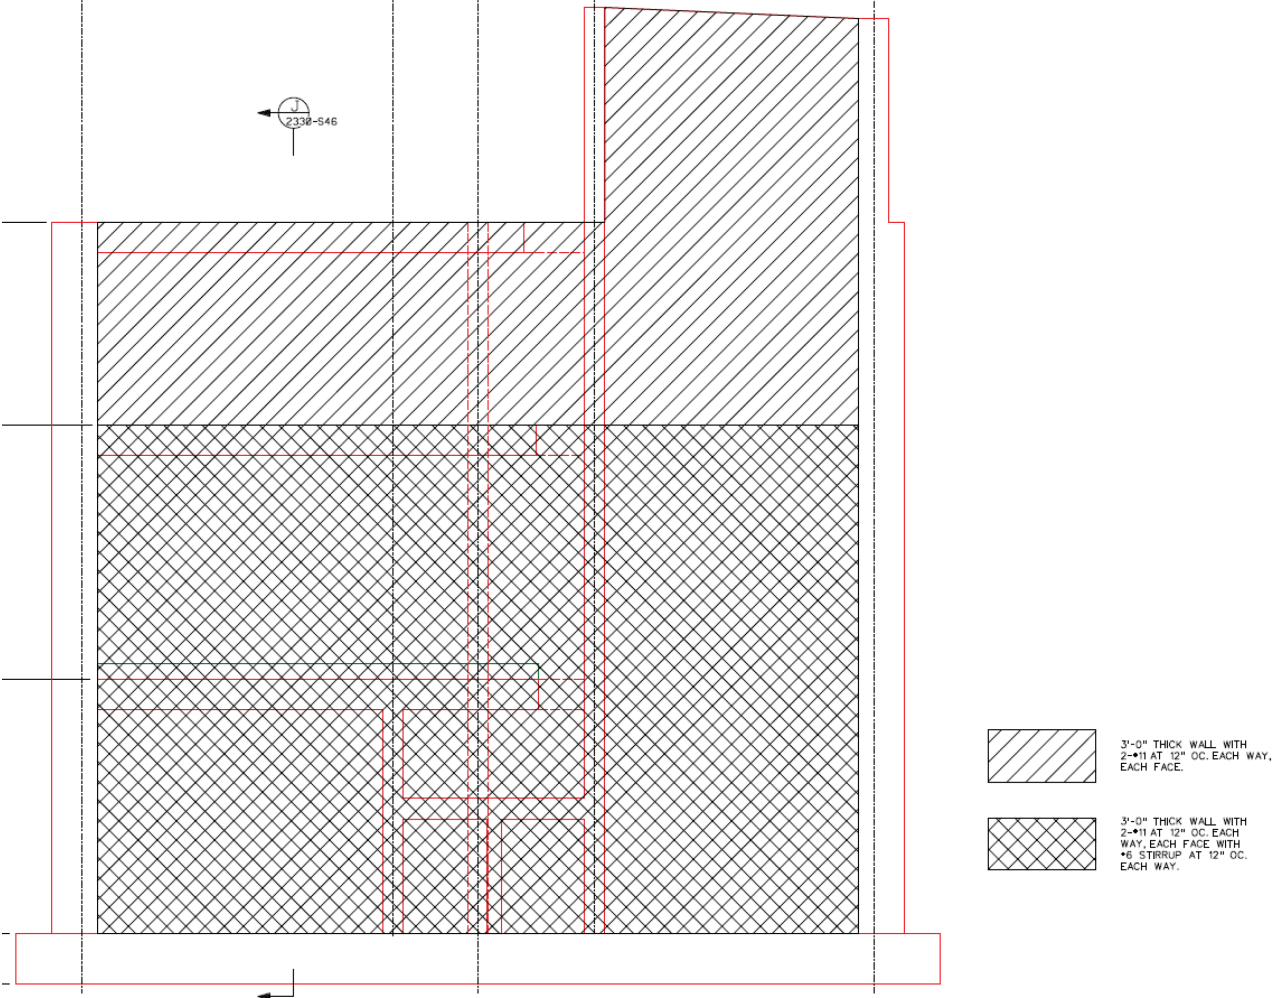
B-73: CRB Reinforcement Section View of Wall on Grid Line A
